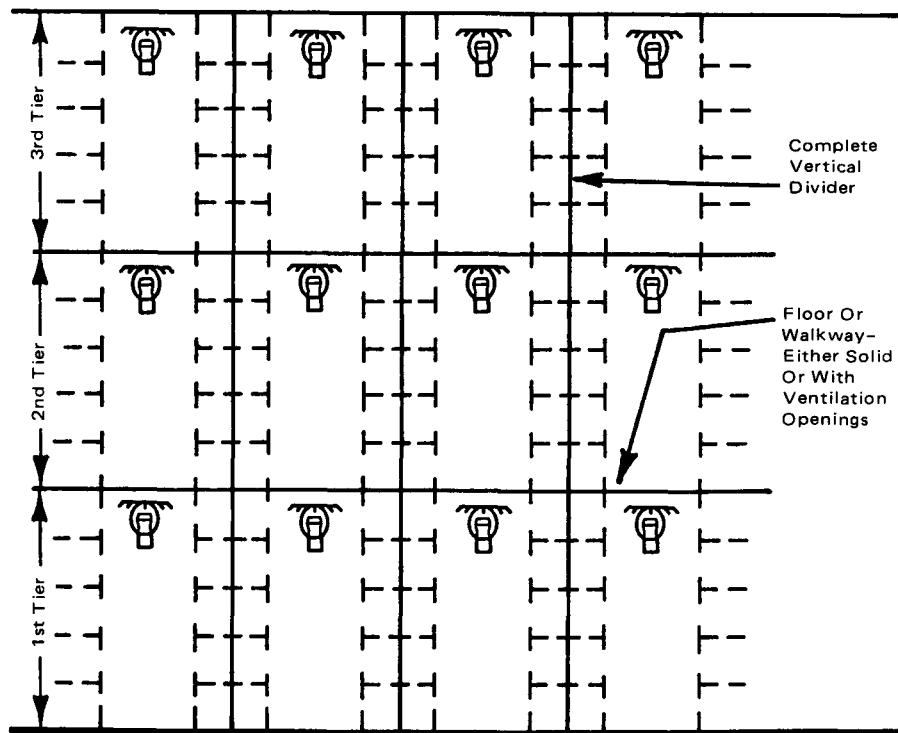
(a) Sprinklers in multtier library bookstacks with complete vertical dividers.
